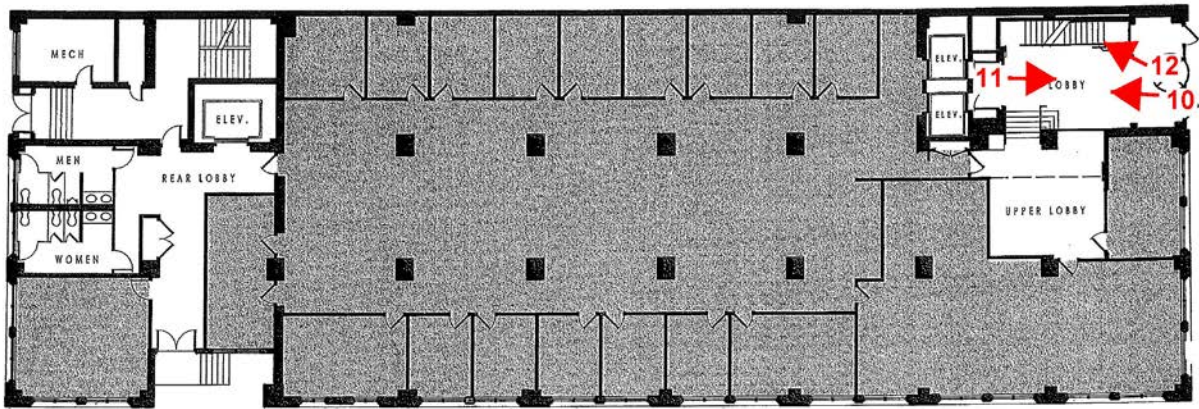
First floor plan and photo key, *Continental Real Estate*.
